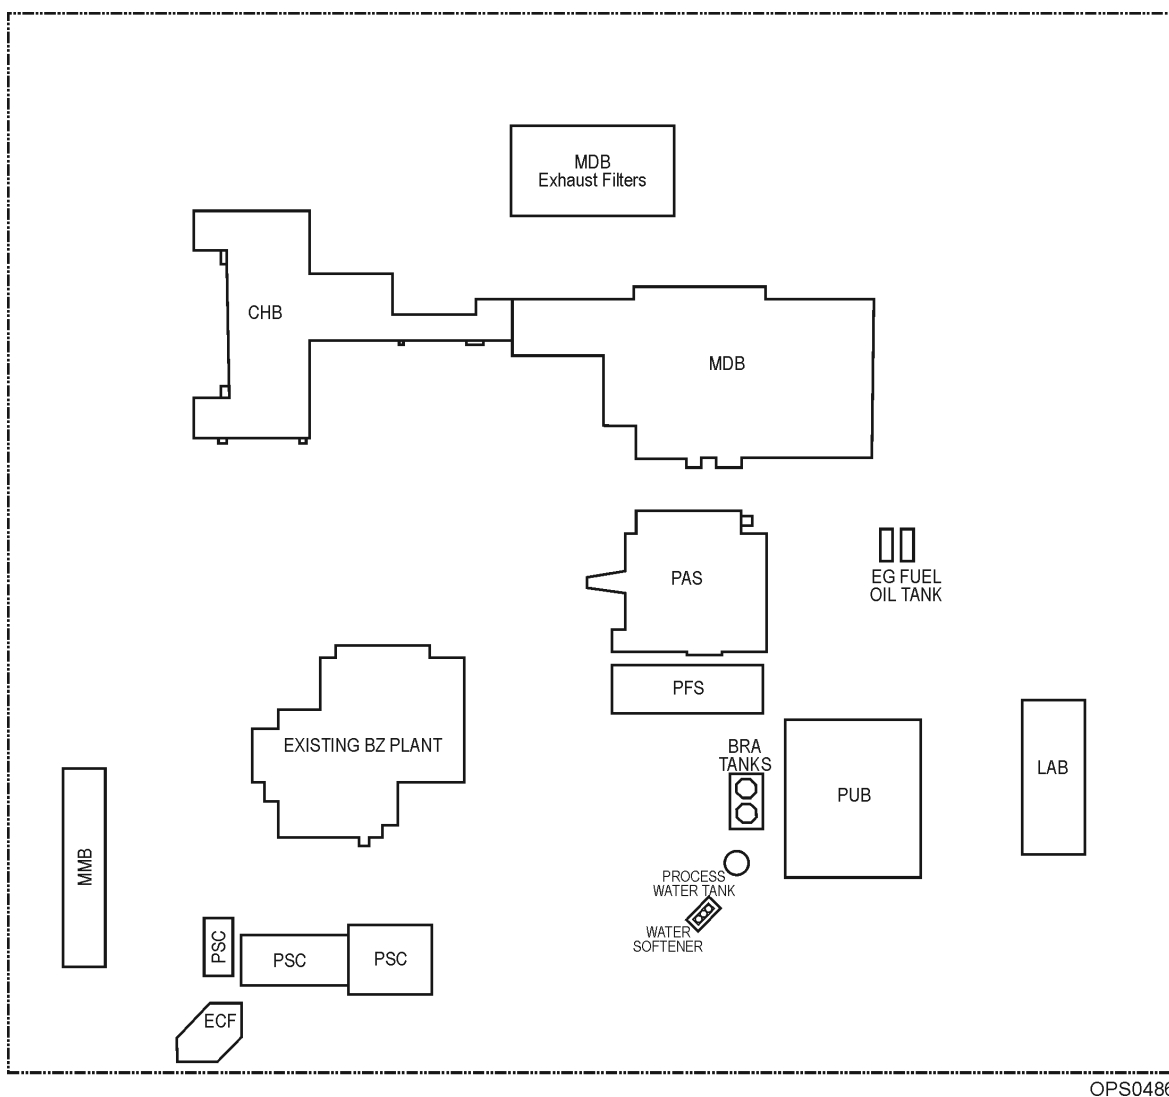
Chemical Agent Disposal Facility Layout (PBCDF only)
